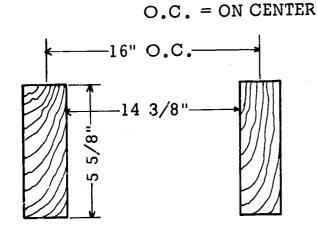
A-4. Layout Detail of Header, Sill, and Plate
